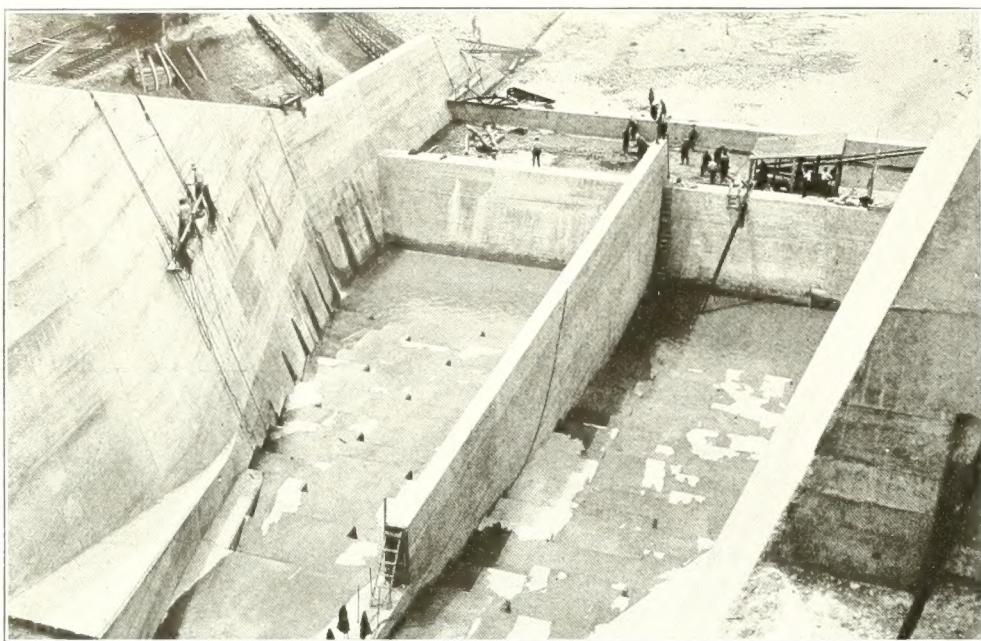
LOCKINGTON OUTLET FROM TOP OF WEST WALL, JUNE 11, 1919.
